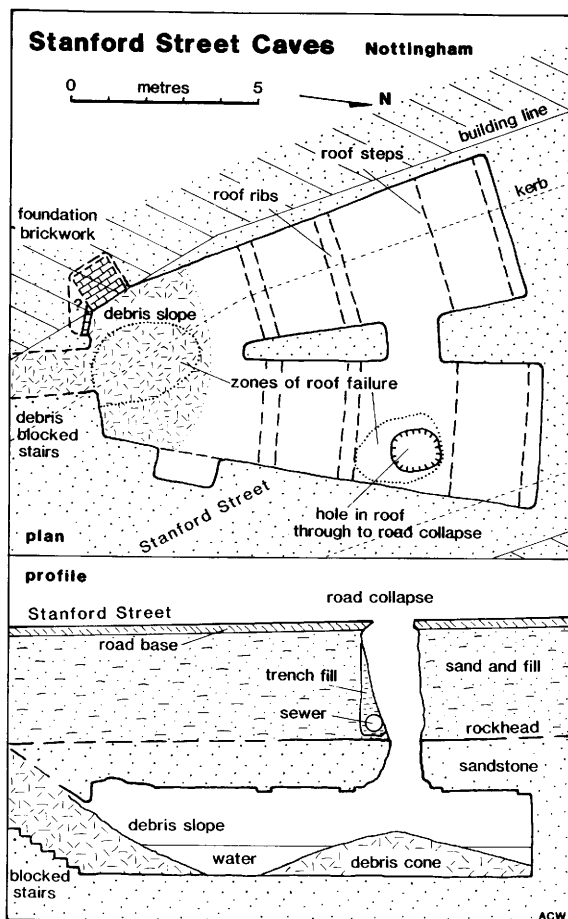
Plan and profile of the Stanford Street 'caves'.
